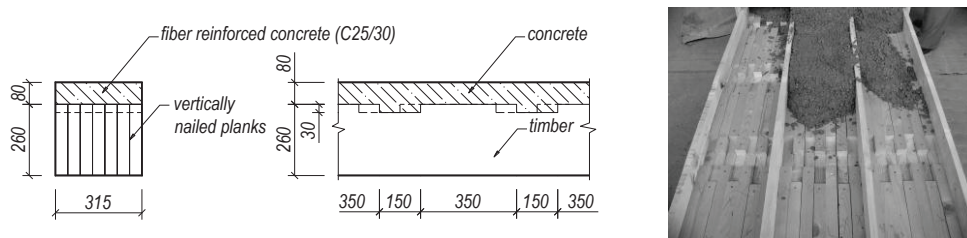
Cross-section and groove connection of experimental beams Type 2; b) Preparation of specimens
